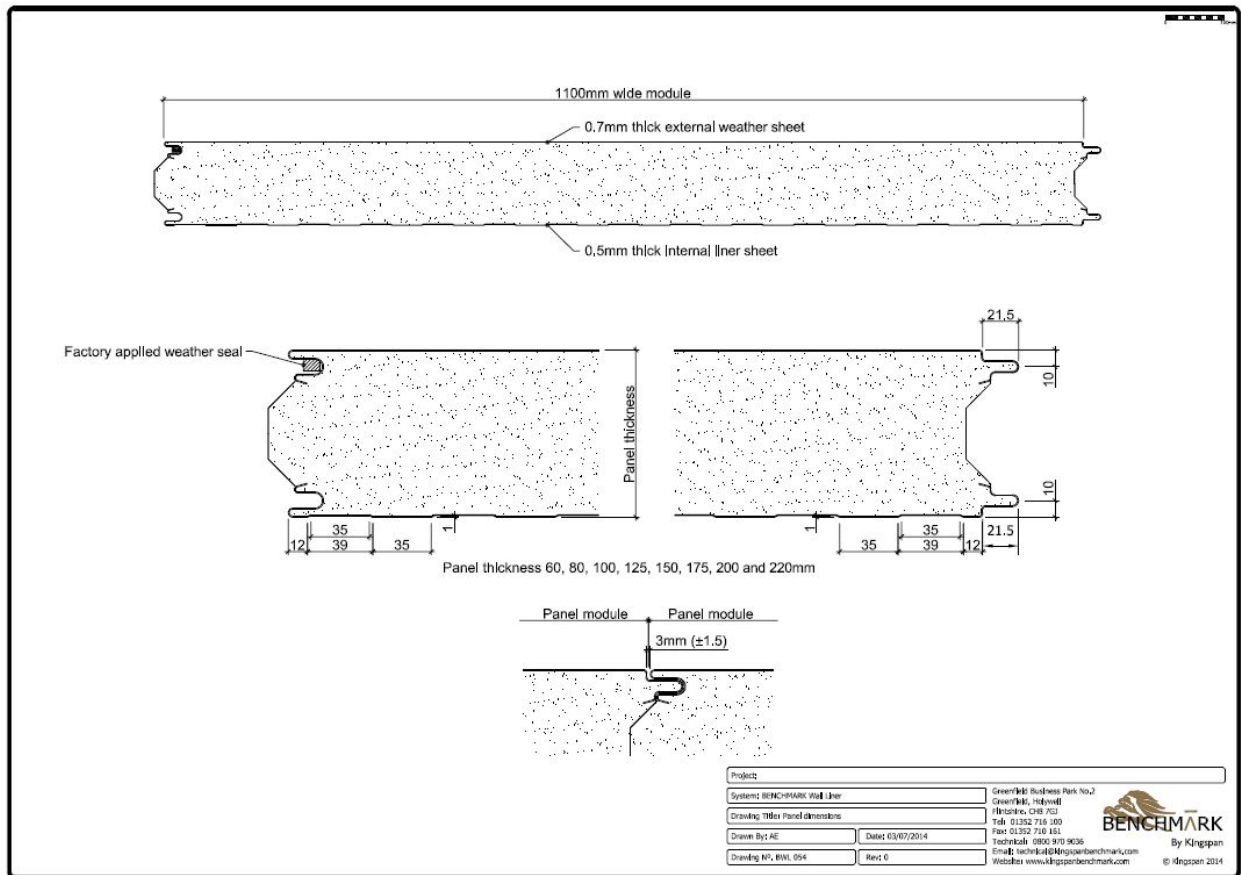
Construction of the System showing the key dimensions of the BENCHMARK wall liner panel.
